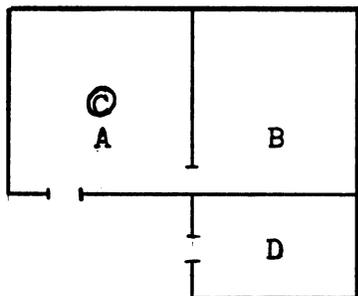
Floor Plan of House in Eastern Serbia. A) Kitchen, B) Soba, C) Fireplace, D) Storeroom
